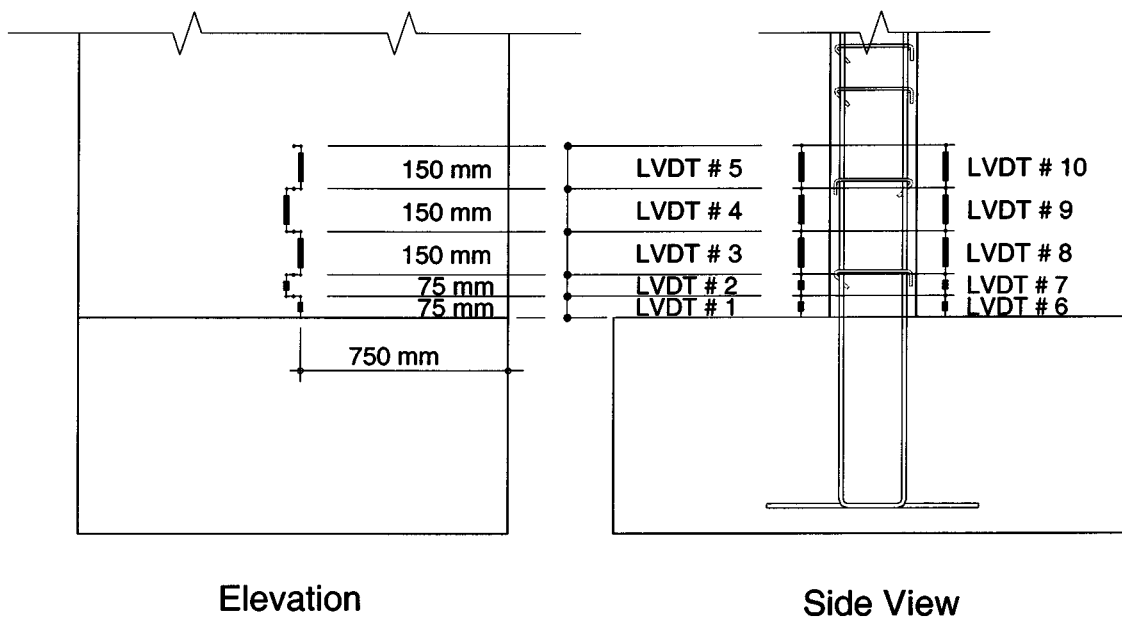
Typical Locations of LVDT's for a Test Specimen
